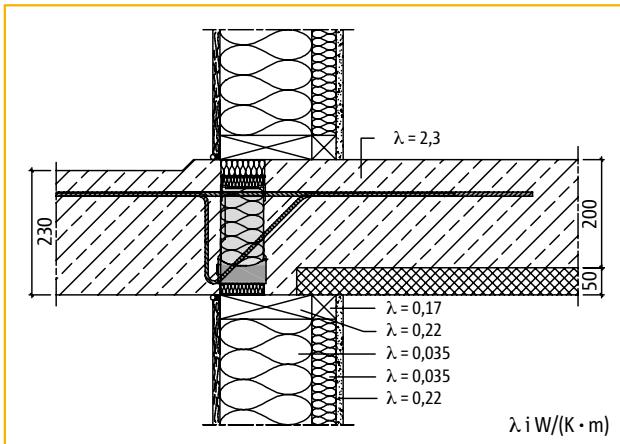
Balcony slab connection with Schöck Isokorb® type K50 and a composite thermal insulation system
